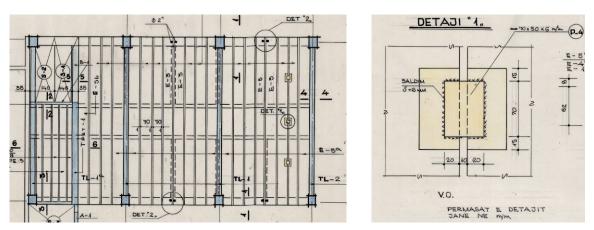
Slab panels connected with steel plates exhibit the partial diaphragm effect.(left). A detailed design of ISP4 is shown (right)(AQTN, 1999).
